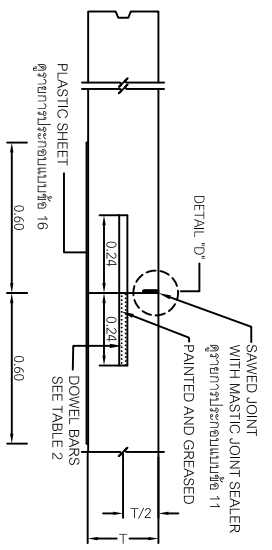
DETAIL OF JOINT BETWEEN NEW AND EXISTING CONCRETE PAVEMENT (LONGITUDINAL JOINT)
